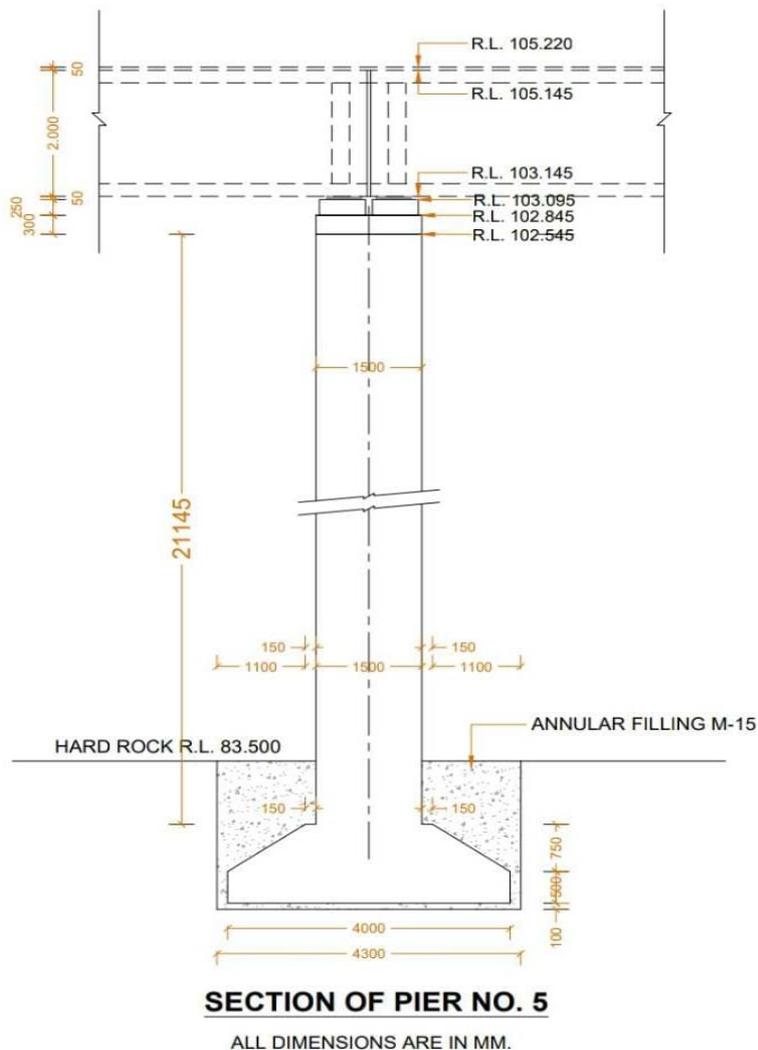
Section of newly constructed Ankali bridge pier no. 5 (P.W.D., Miraj)
